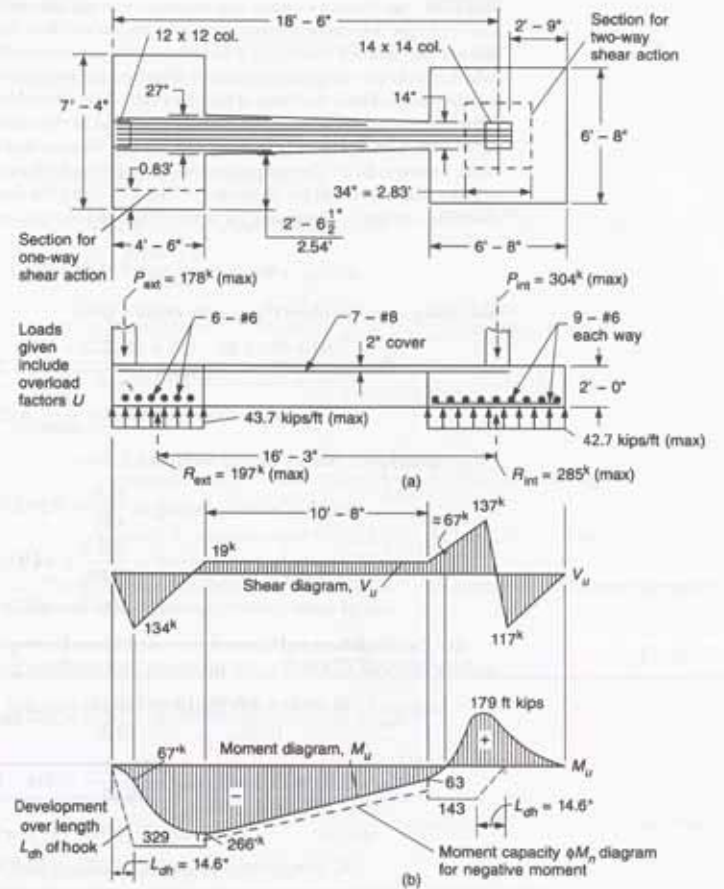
Cantilever, or strap, footing of Example 20.13.2.
